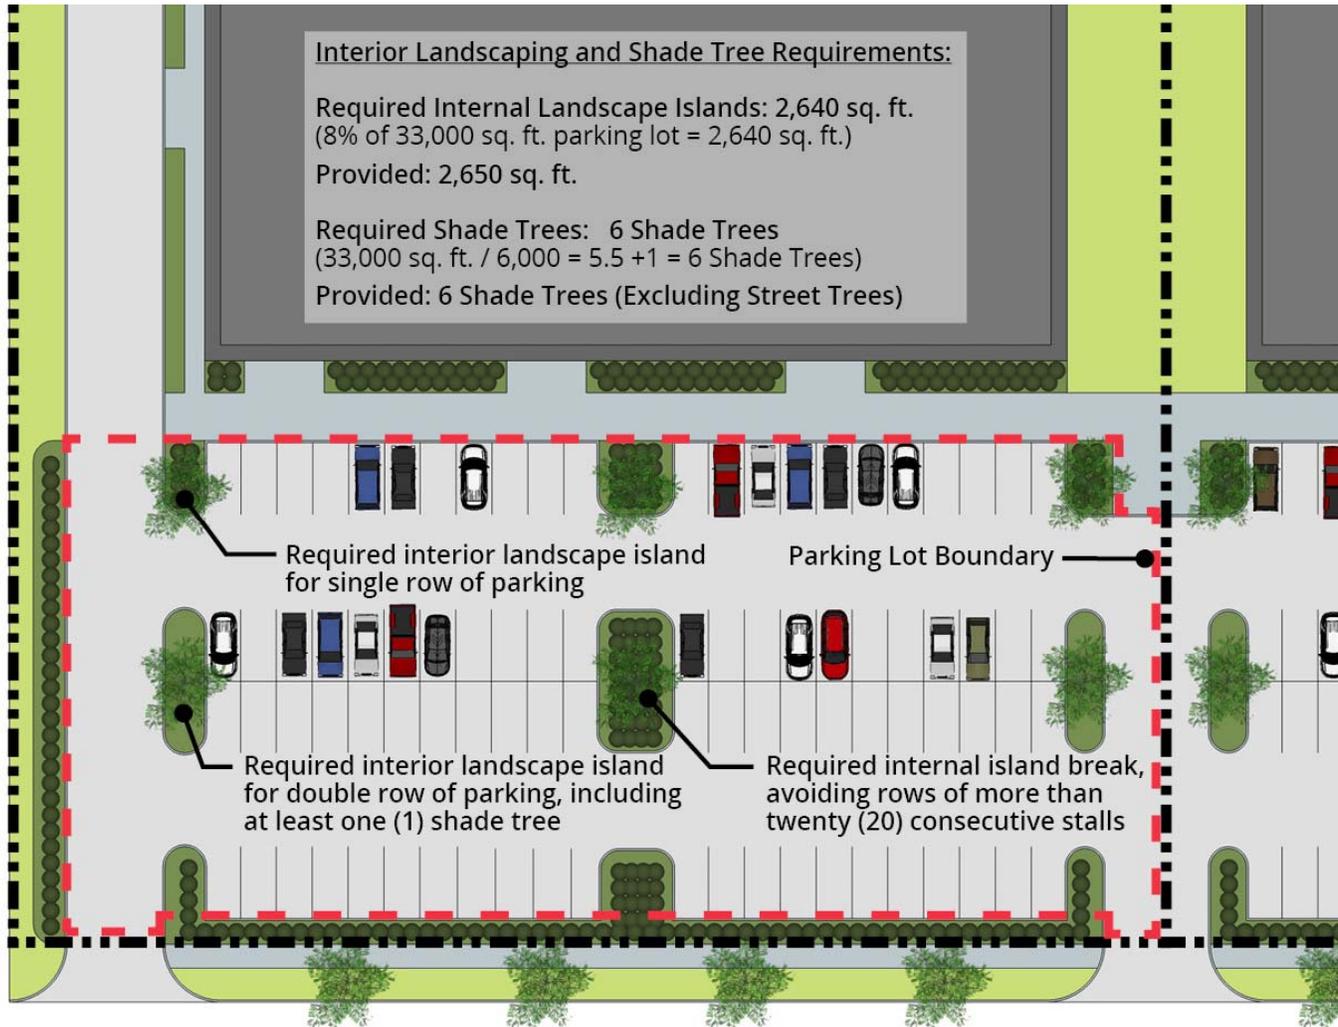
PARKING LOT INTERIOR LANDSCAPING DIAGRAM
